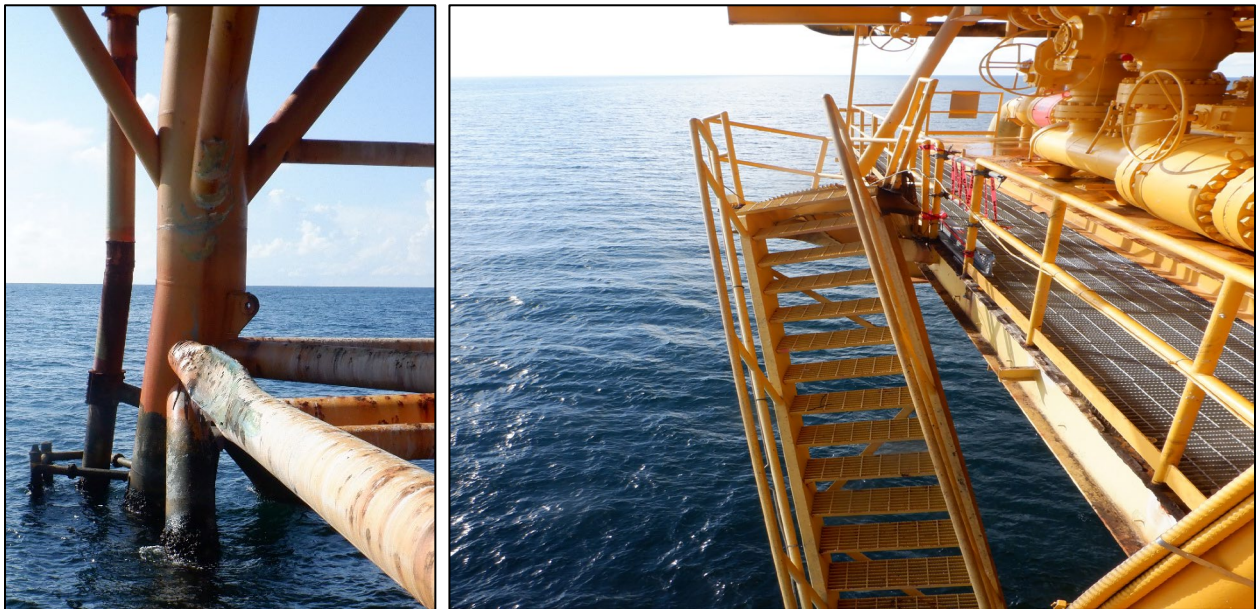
Left to right: Damage to the under-support piping, and the damaged access ladder on platform VK-817A. (Source: Third Coast)
